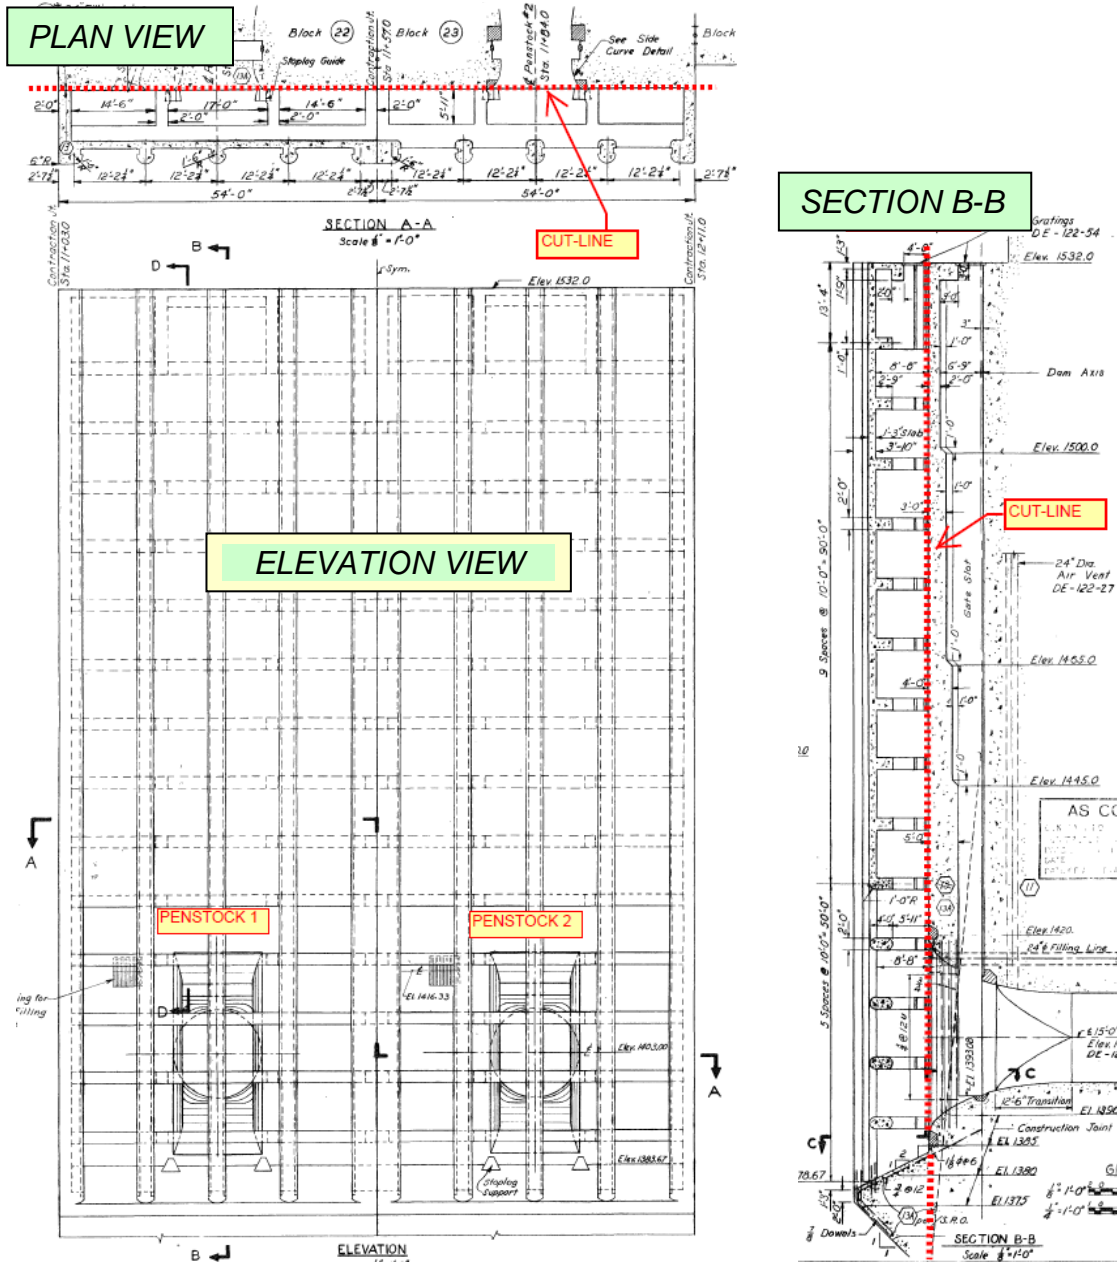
Schematic of Penstock Trash Rack Structure Removal
